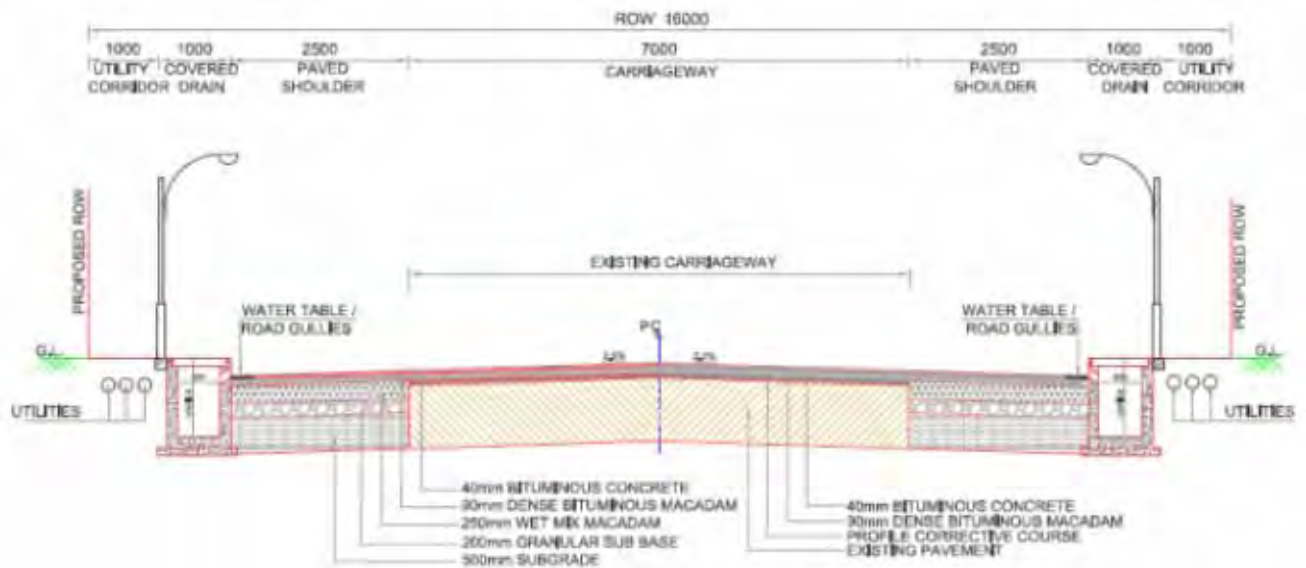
C2-V-O : Two Lane Carriageway with Paved Shoulder in Village Area (Overlay)
